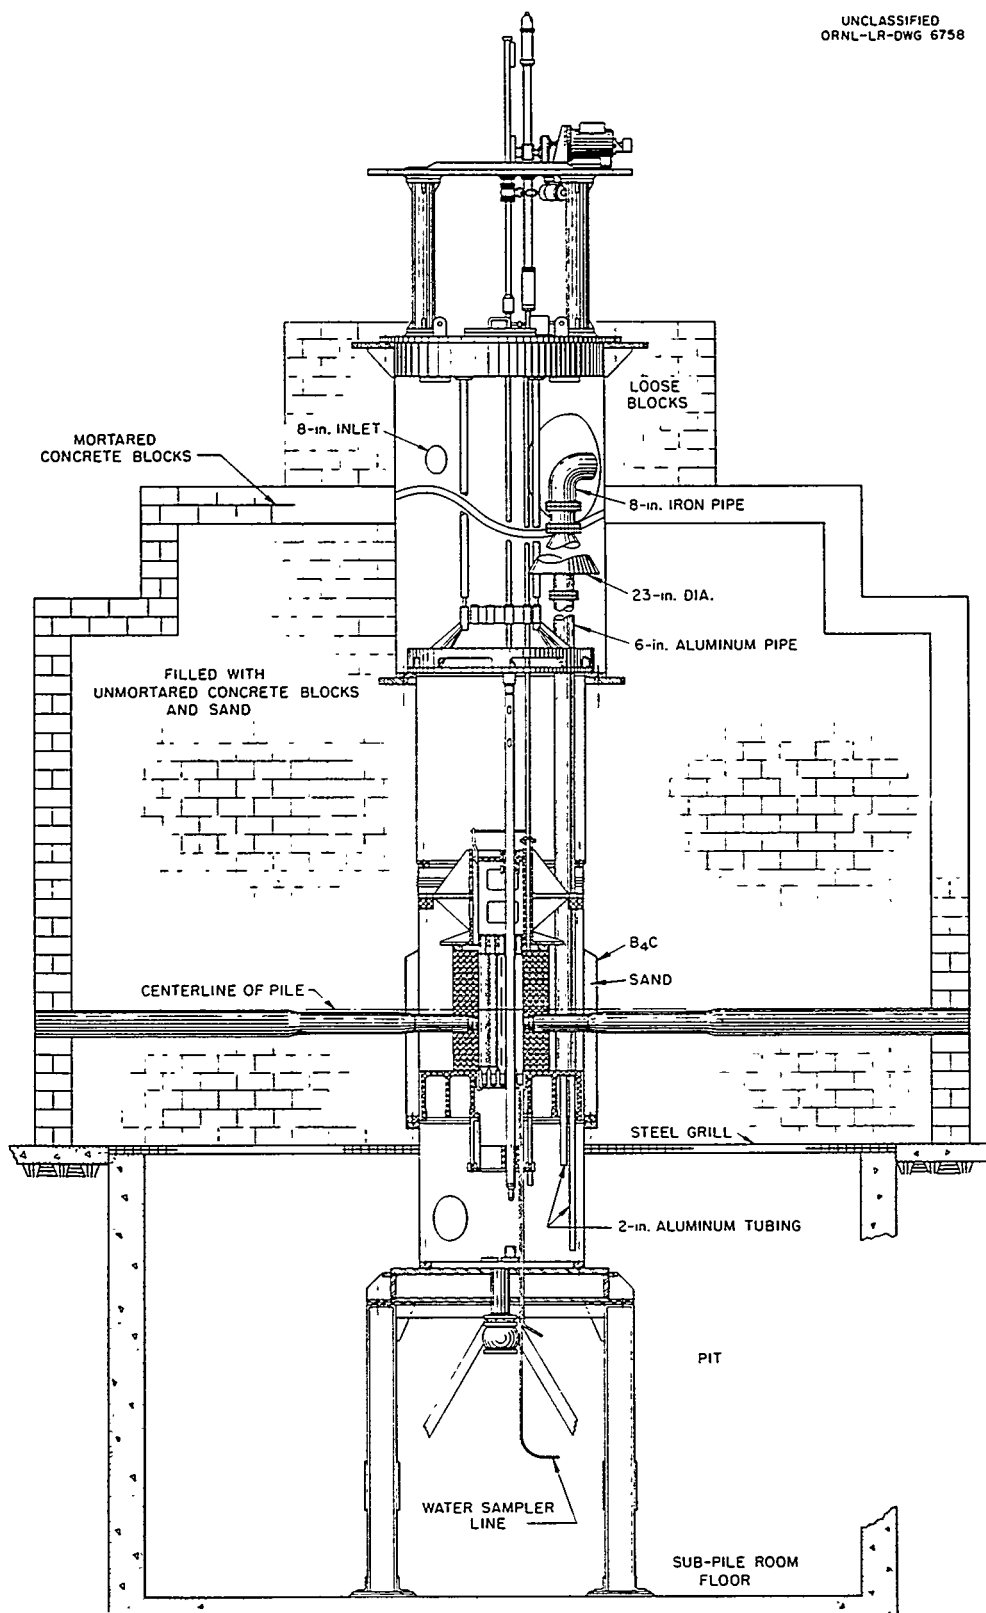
Sectional Drawing of the LITR Showing the Reactor Tank, Core, Beam Holes, Shielding and Internal Water Lines.
